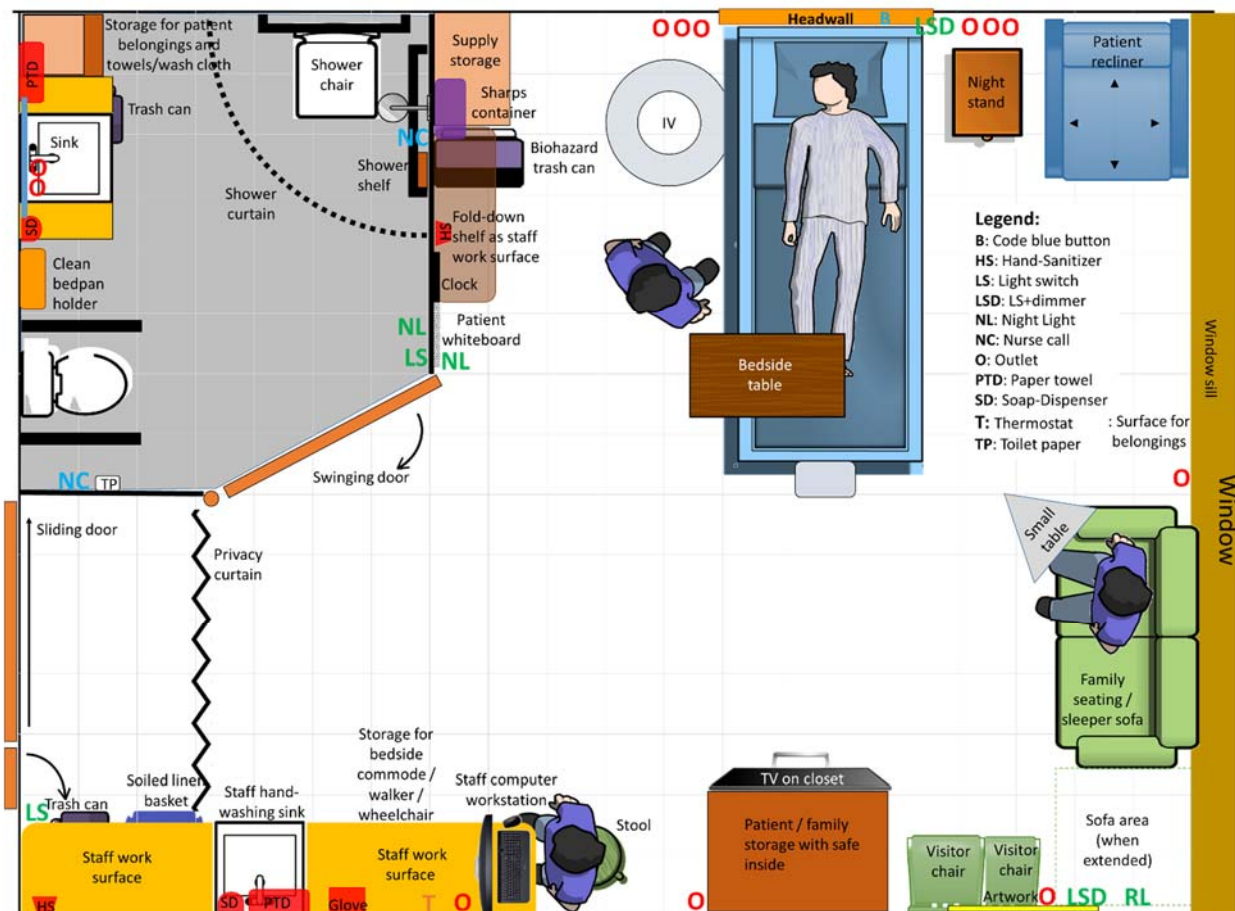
Hybrid room based on the 12 layout designs where the bed is located adjacent to the inboard bathroom.
